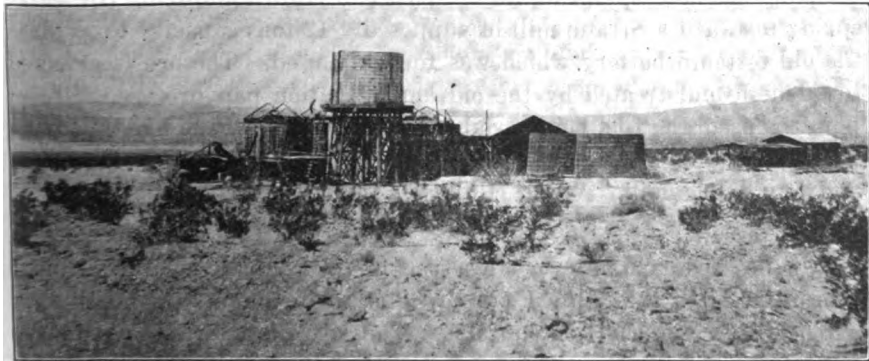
Cyanide plant of the Daggett Reduction Co. in process of construction, five miles north of Calico.
